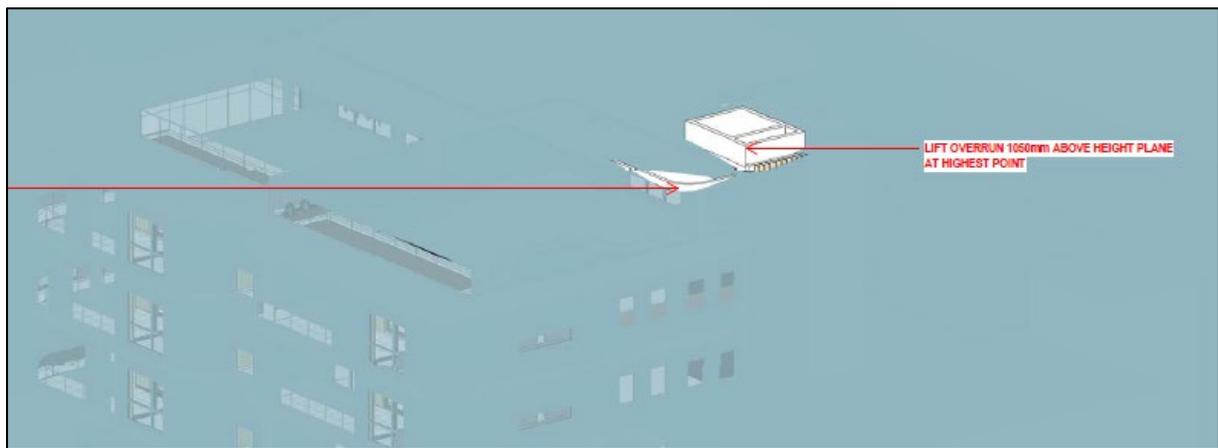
extract of plan identifying the portions of the building which breach the height plane
